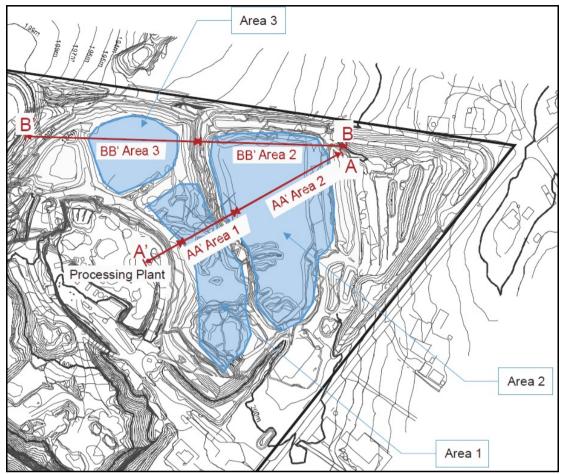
Plan showing location of three (3) stage dam construction with location of cross sections.
